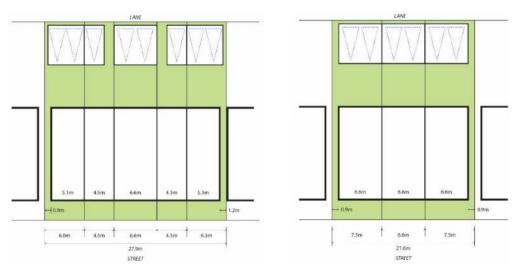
Two examples of lot subdivision for 'sets' of attached or abutting dwellings
